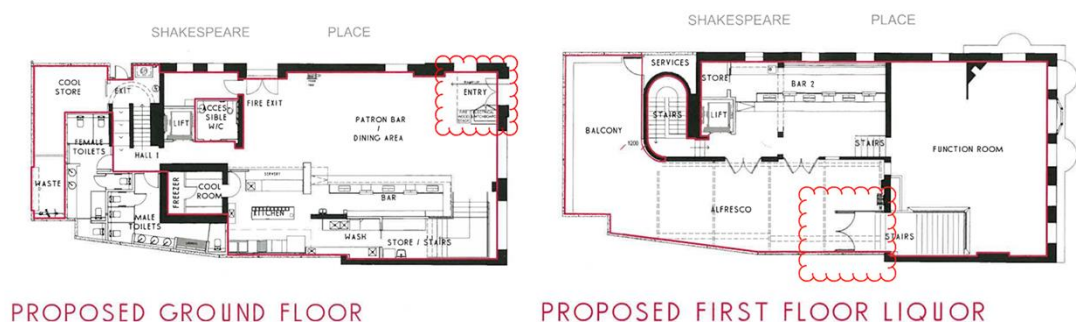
Location of open doors during testing (Source: Email from Permit Applicant).
